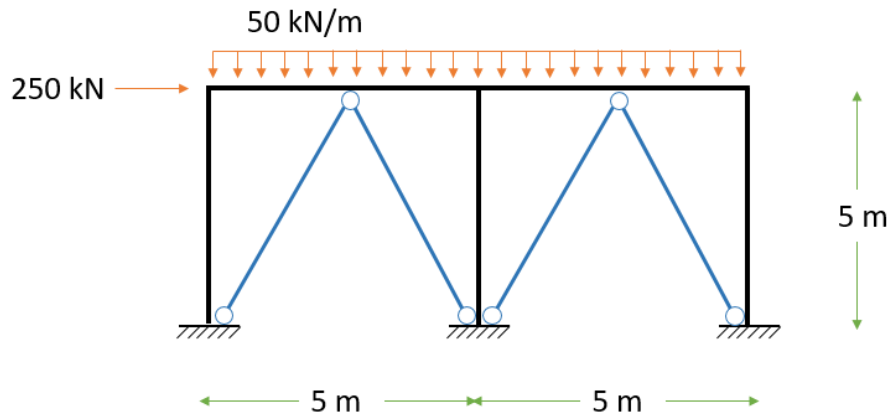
Test problem – 2-bay frame with inverted V bracing
